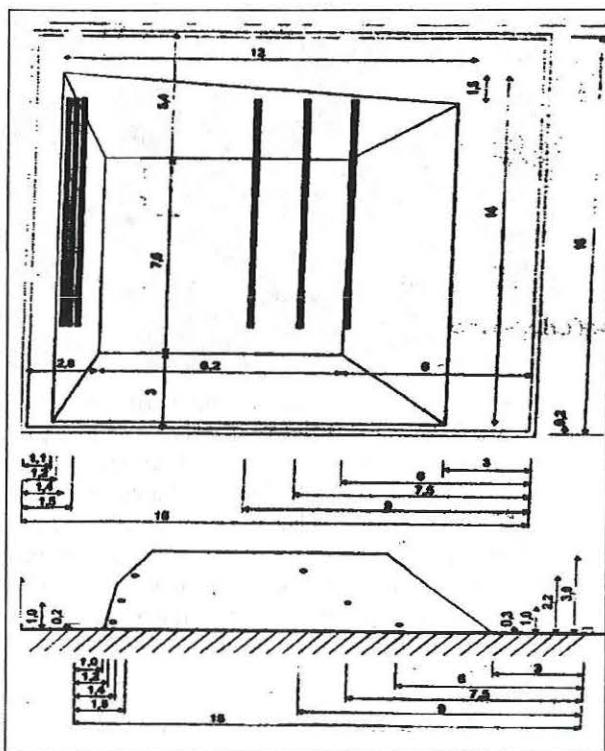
Plan View (top) and Cross Section of the Heap in Austria
